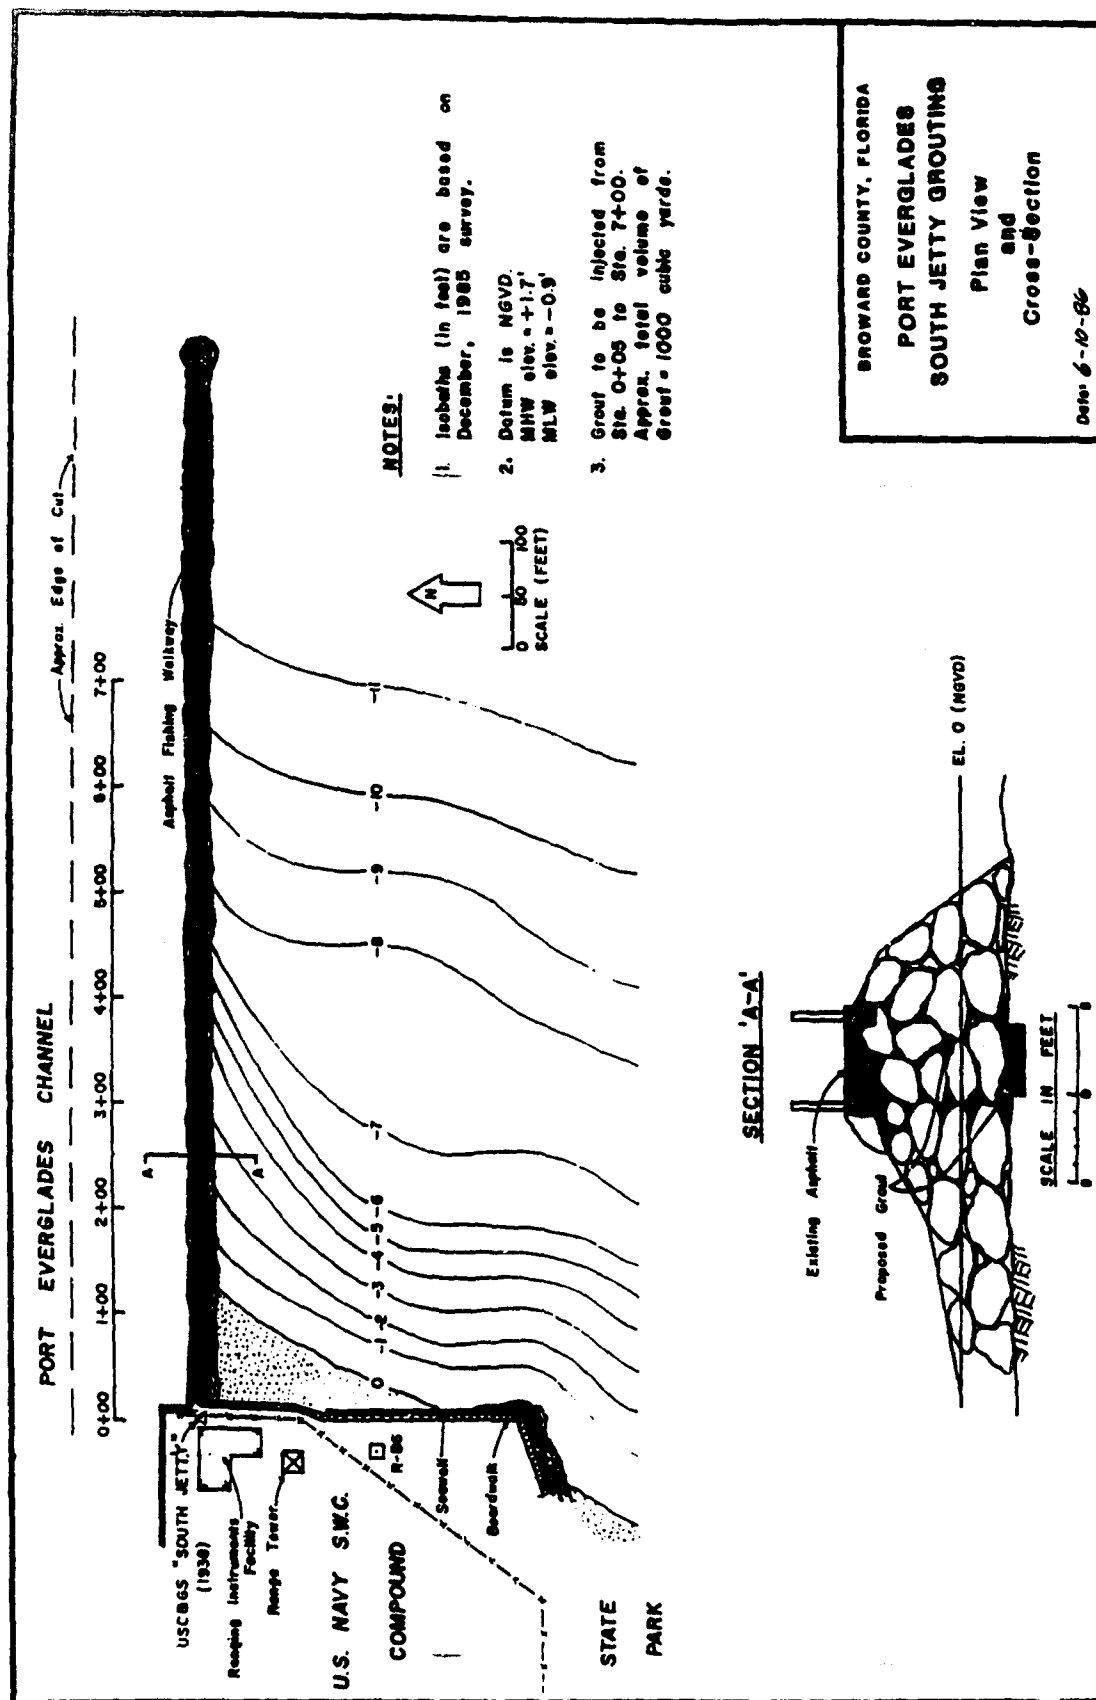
Plan view and cross section, Port Everglades, FL, south jetty sealing project (after BCEQCB 1986)
